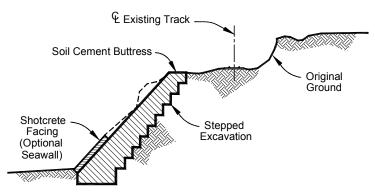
Typical Soil Cement Buttress Wall Alternative
